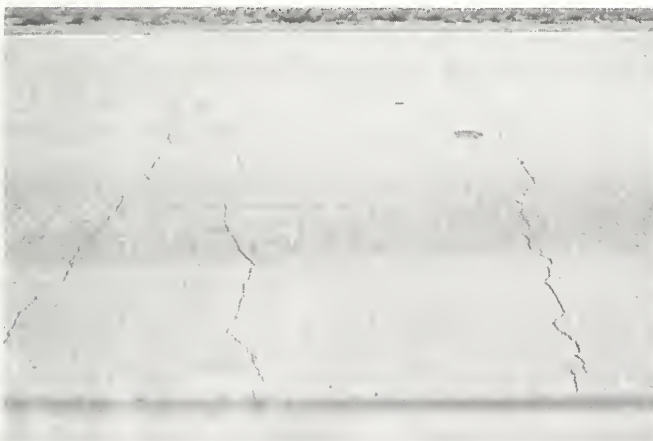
A TYPICAL BIFURCATED CRACK WITH A CRACK INTERSECTION
